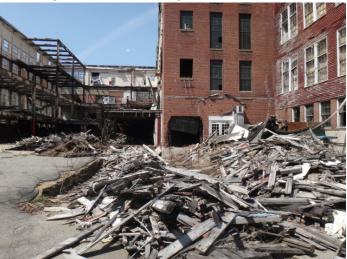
Construction and demolition debris widespread throughout the eastern portion of the Site. View is to the west.
